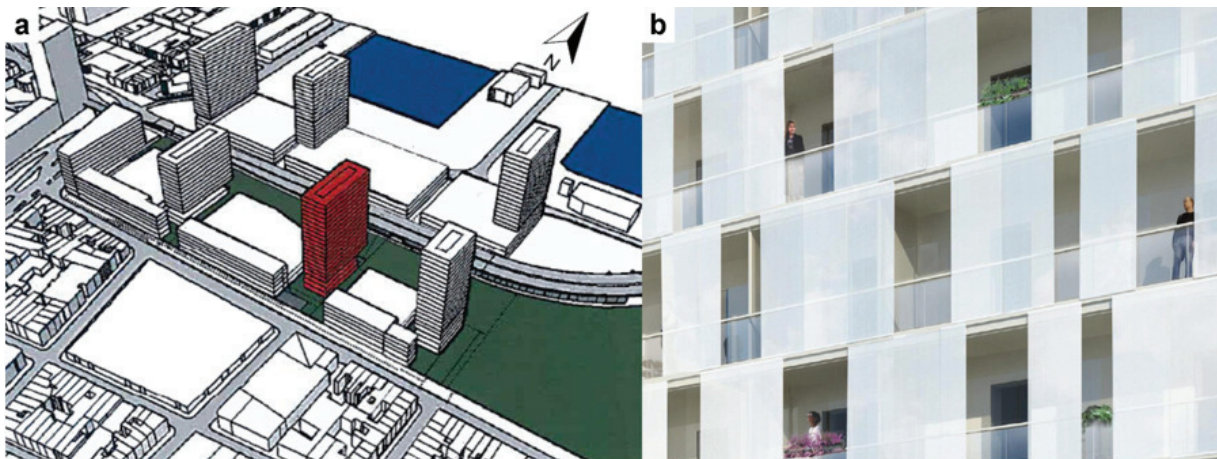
(a) High-rise building under study (red) and nearby urban surroundings. (b) Building facade with second-skin staggered facade concept.
